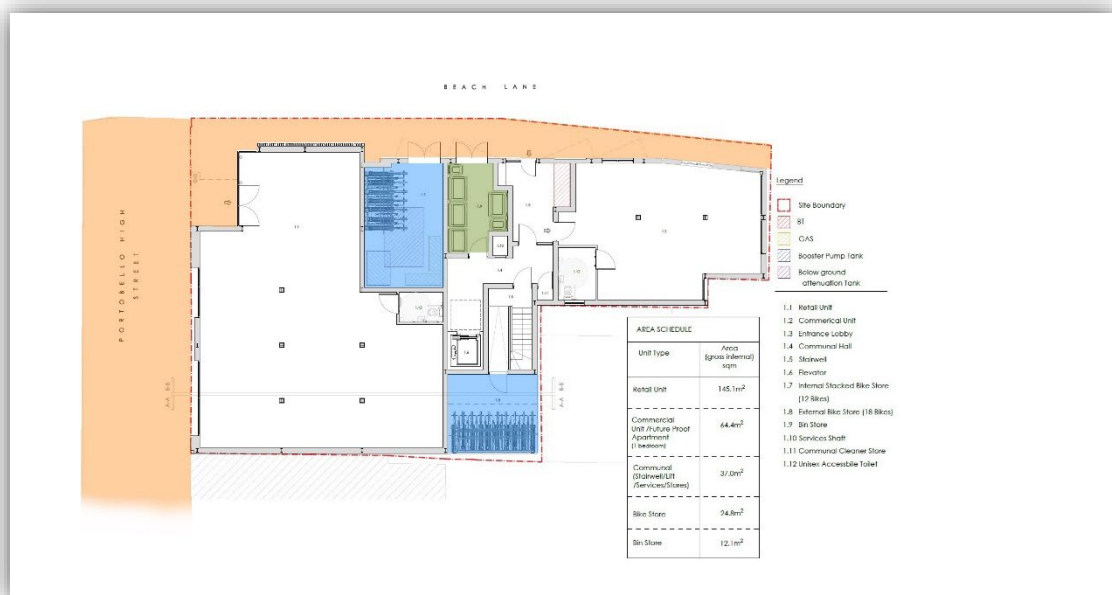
Proposed ground floor plan, highlighting bin store, cycle parking and public realm
